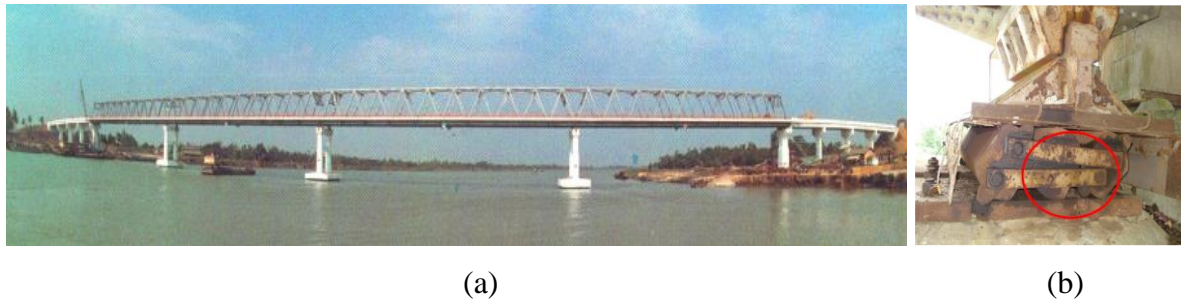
(a) Side view of Maubin Bridge [5]; (b) Deformed shoes of Maubin Bridge [7].
